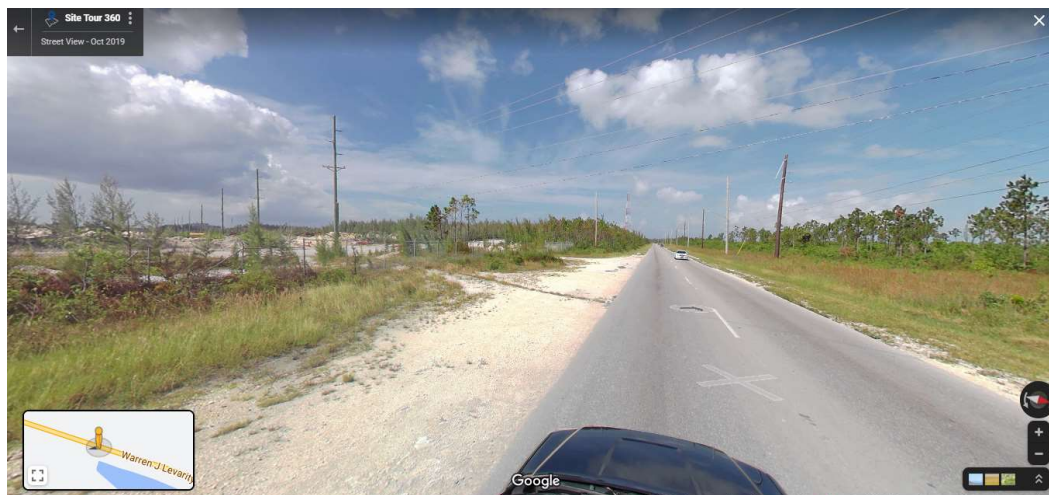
Street level view of WJL Highway looking east (Source is Google Earth™)
